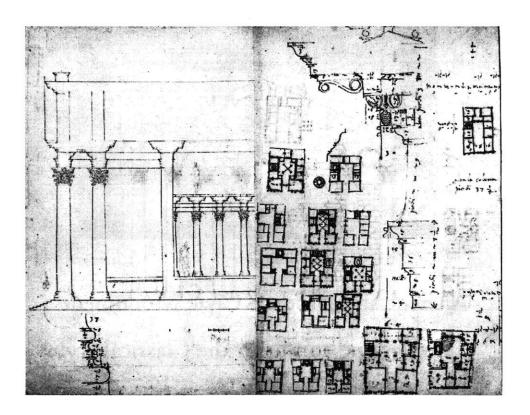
Palladio's sketch for the façade of a palace and misc. floor plans
